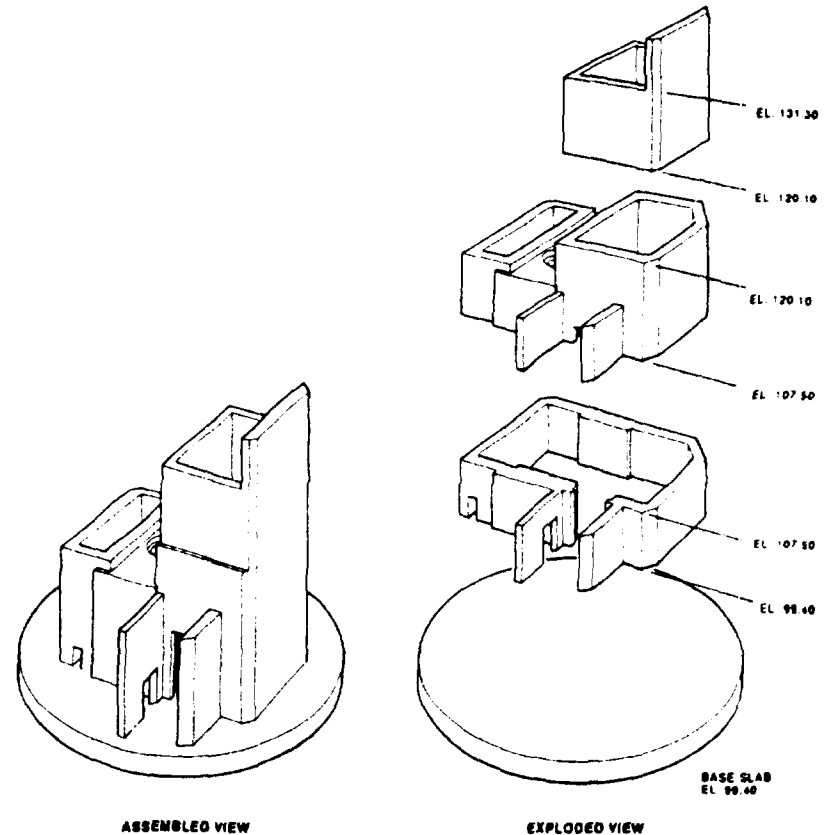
REACTOR BUILDING INTERNAL CONCRETE STRUCTURE ASSEMBLED AND EXPLODED VIEWS
